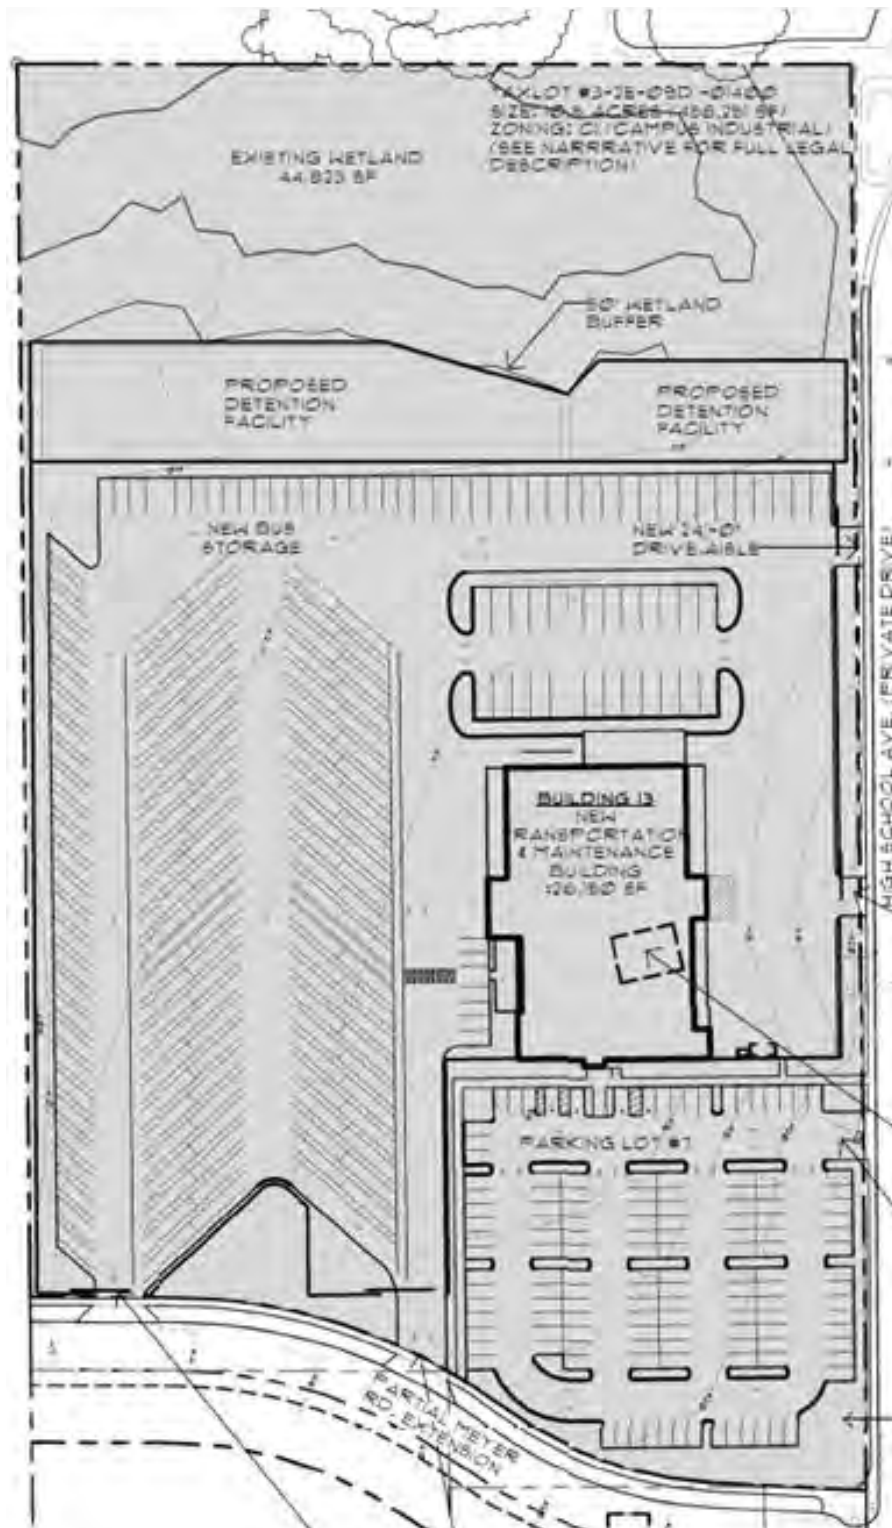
Proposed Detailed Development Plan for the Transportation Maintenance Facility
